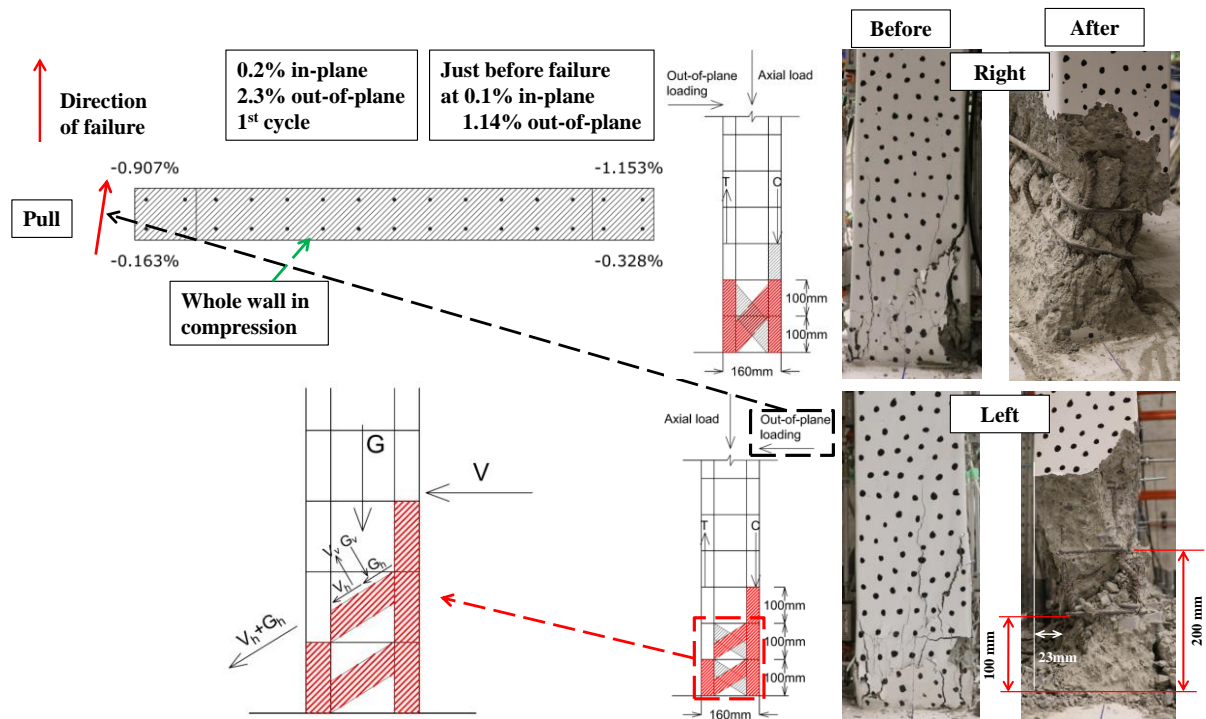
Strut and tie model of specimen SP2-ND just before failure
